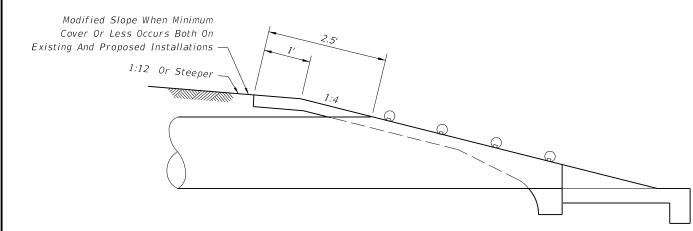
# DETAILS FOR CONCRETE & CORRUGATED METAL PIPE
